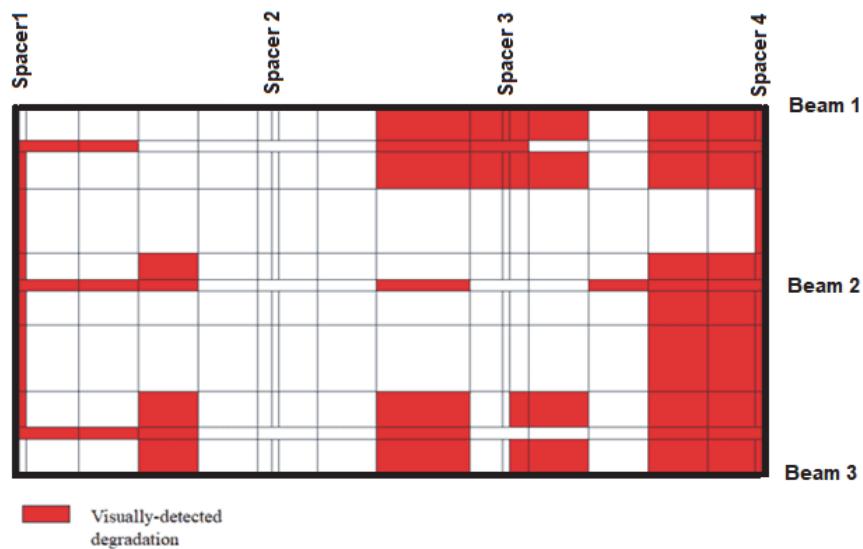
Plan view of the bridge with visual inspection damage identification.
